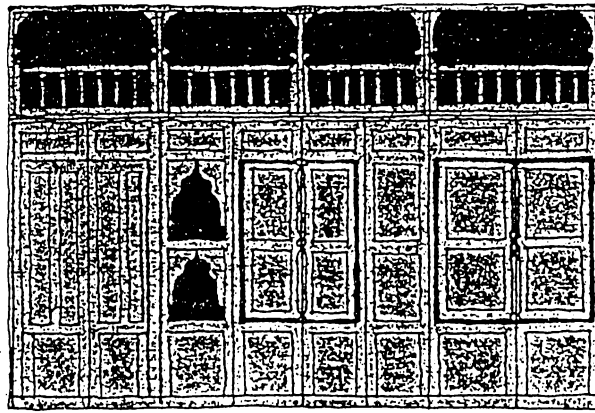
A standard cupboard elevation in a traditional room (Source: Küçükerman, 1989).
